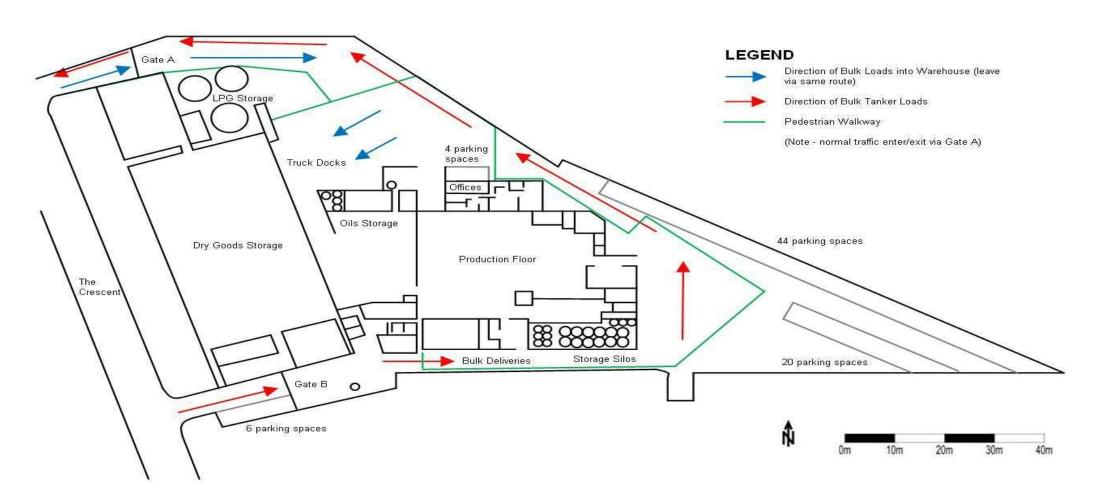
Allied Pinnacle Kingsgrove site layout plan.
